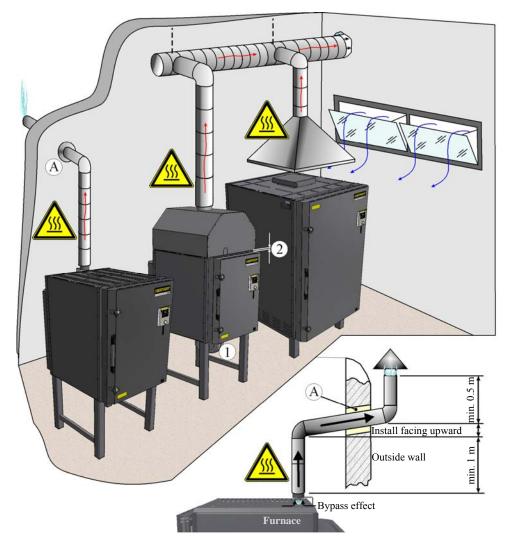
Example: Assembling exhaust air piping (similar to picture)
